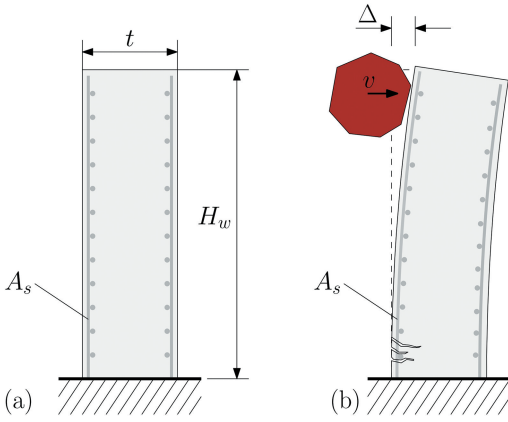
Sketch of the concrete wall to protect the road infrastructure from falling rocks: (a) geometry, (b) the maximum displacement during impact.
